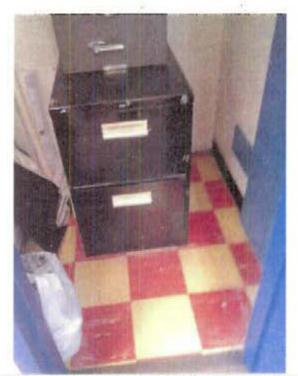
9"x9" floor tiles are suspected to be asbestos containing material.
